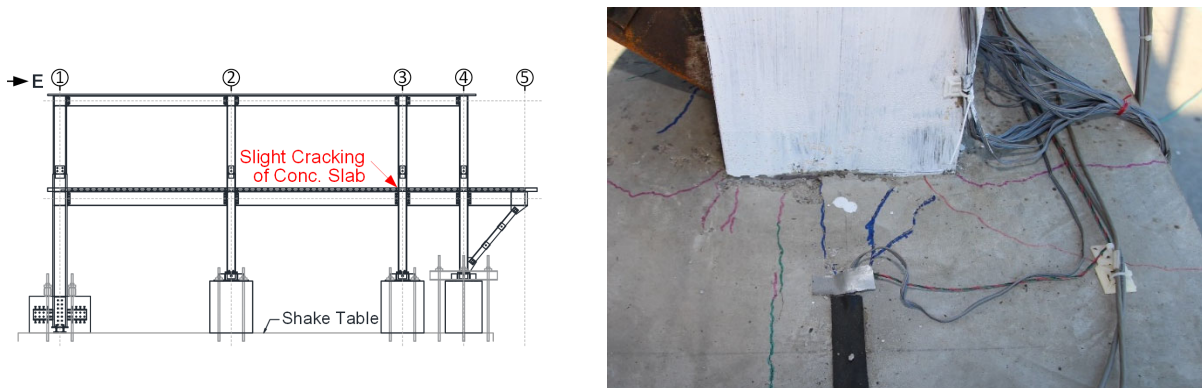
After Test 2B-5: Cracking of Slab near Column Face at 2<sup>nd</sup> Floor BW Connections
